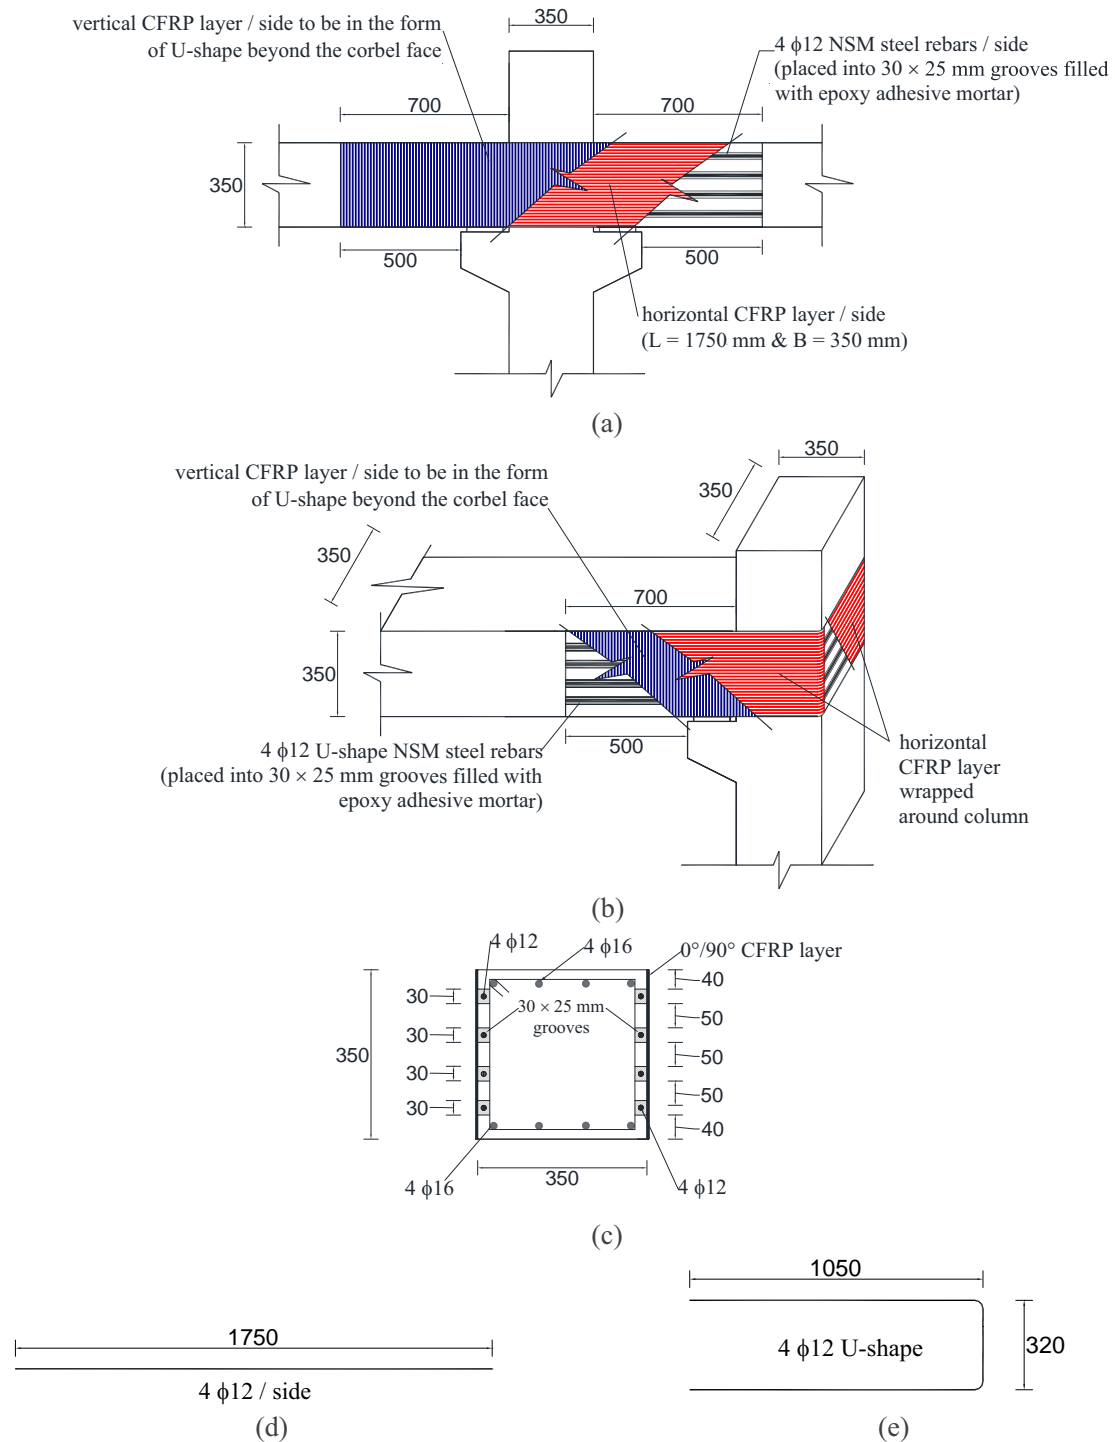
Details of strengthened specimen PC-S (Note: All dimensions are in mm): (a) Middle joint; (b) Outer right joint; (c) Cross section of strengthened beam; (d) NSM rebars for middle joint; (e) NSM rebars for outer right joint – plan view.
